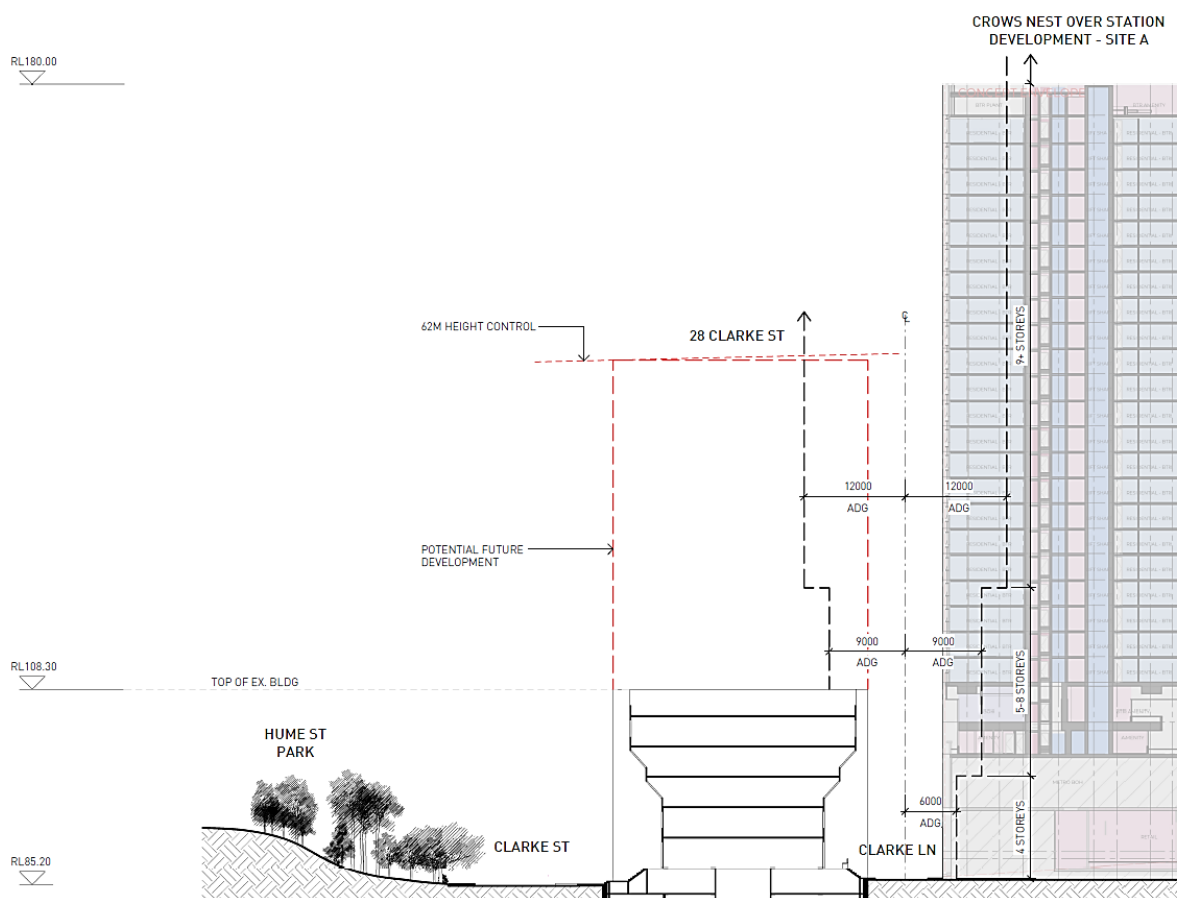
Building Separation study prepared by Smart Design Studio showing proposed Tower 1 (right of image) relative to a future building on our Client's Land (left of image).
